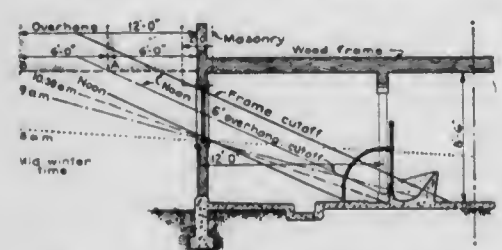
One-half cross-section of a dairy stable 36 feet wide showing direction of the sun's rays at various morning hours and the extent to which overhanging construction affects the entrance of sunlight into the stable.
